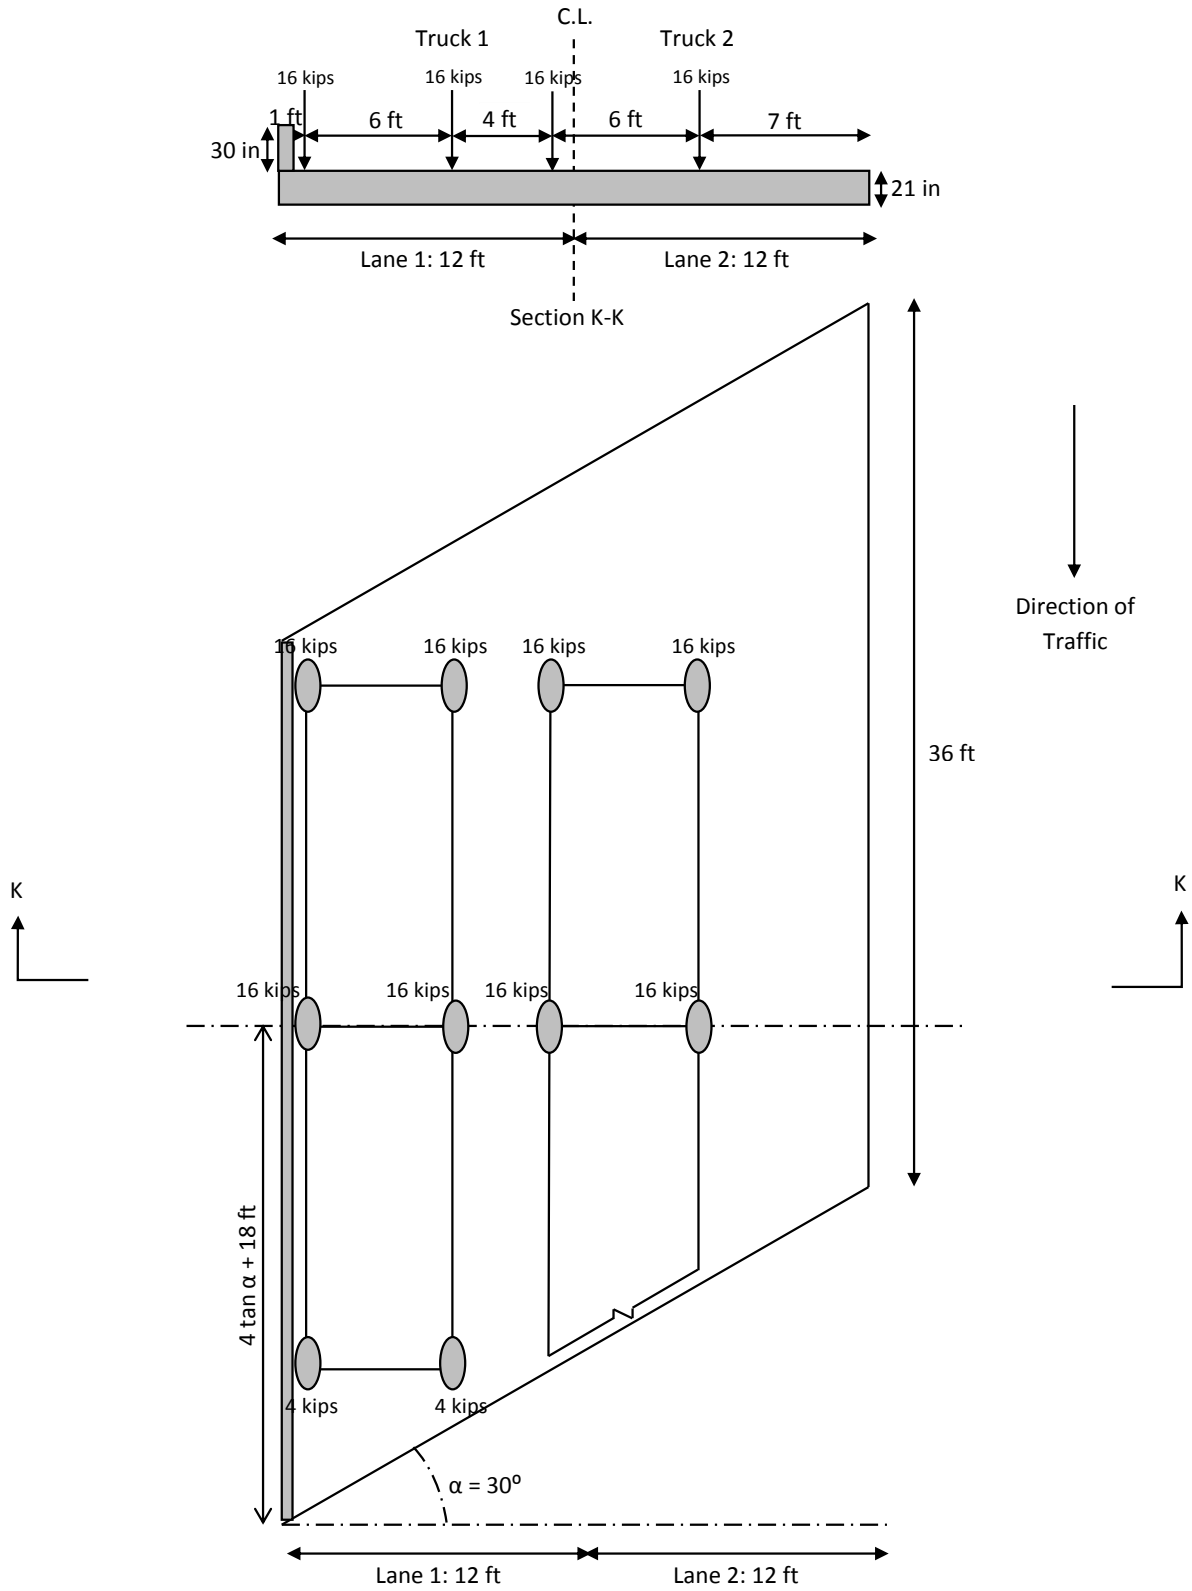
Typical Cross-Section and Plan of a Two-Lane 36 ft Skewed Bridge (30 degrees) with One Railing under Edge Loading E2.
